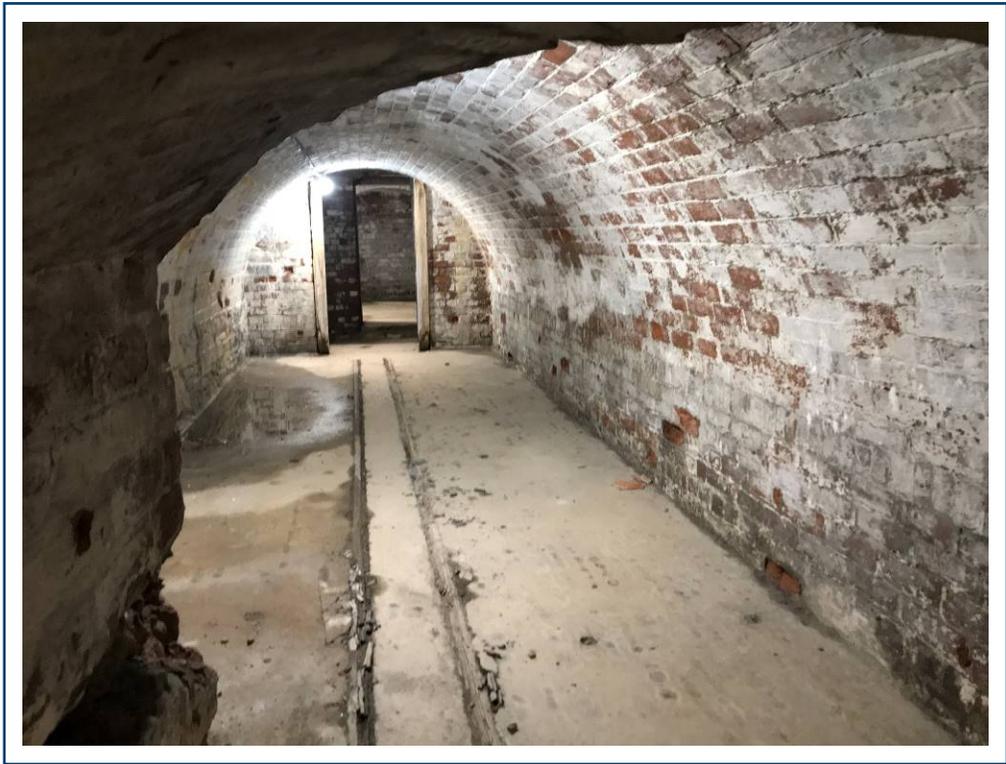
East to West Tunnel, showing white paint in poor condition (note how the condition of the paint varies)
